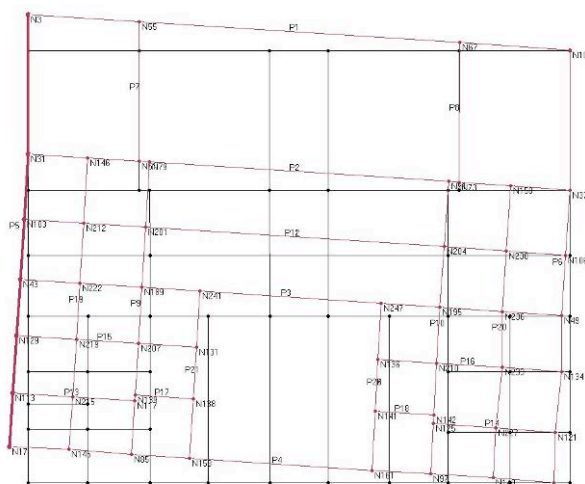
Floor plan of the collapse mechanism of the ground floor
